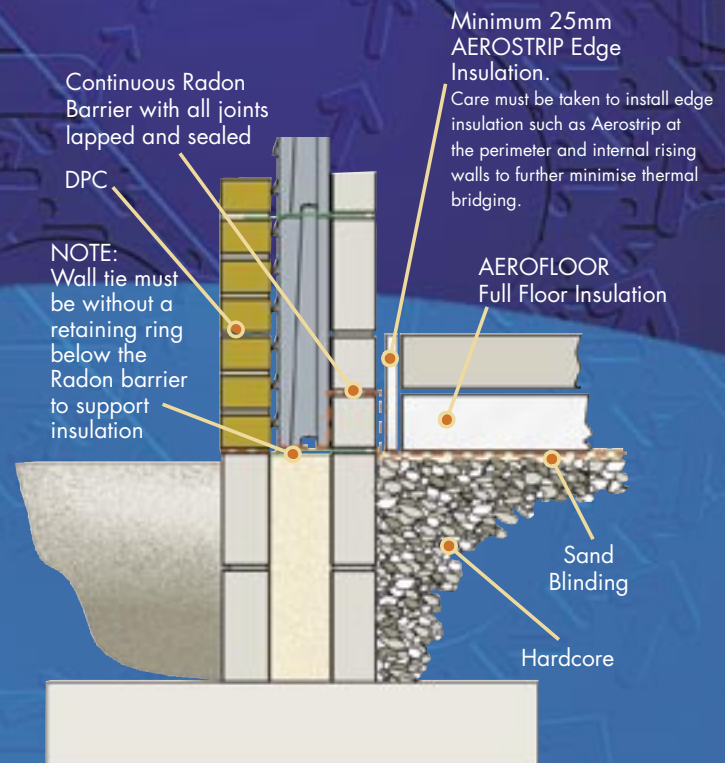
CONCRETE SLAB OVERLAY WITH CAVITY WALL CONSTRUCTION
